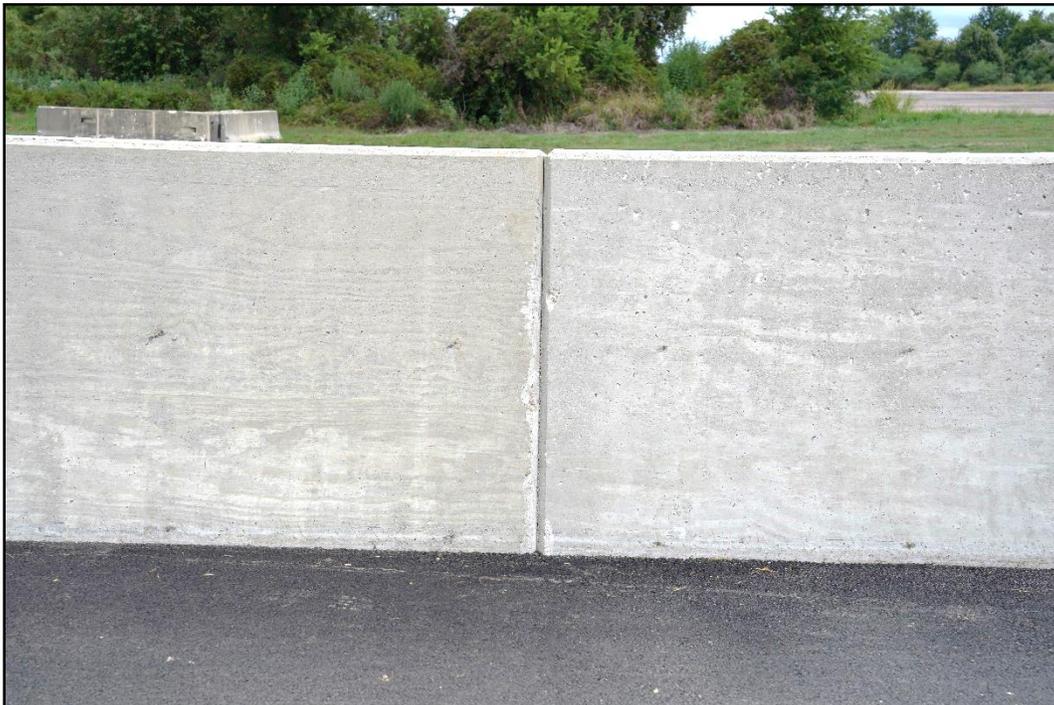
Overall View of the TL-5 Concrete Median Barrier with Shallow Embedment Prior to Testing.
